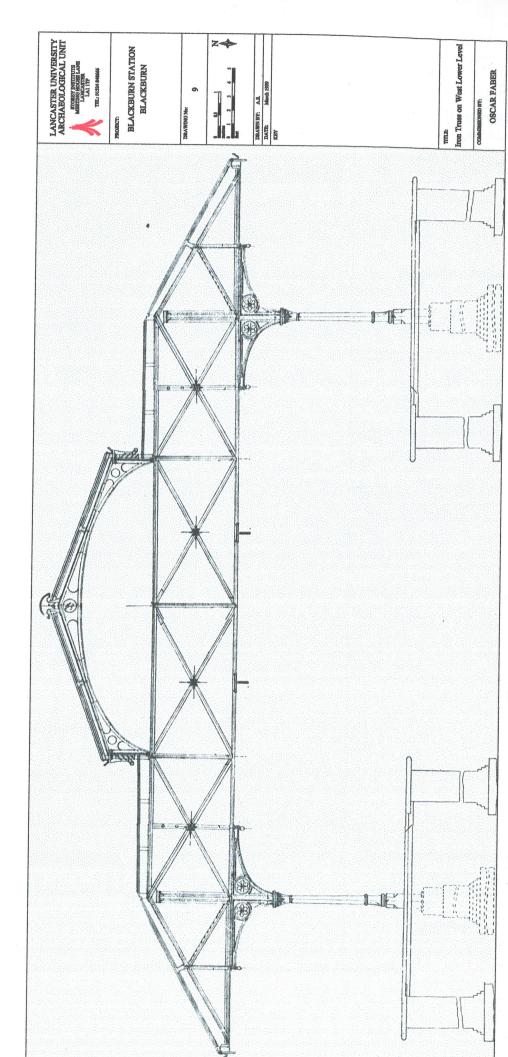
Low Level Canopy Truss over Platform 3 - 1888 Design Drawing
